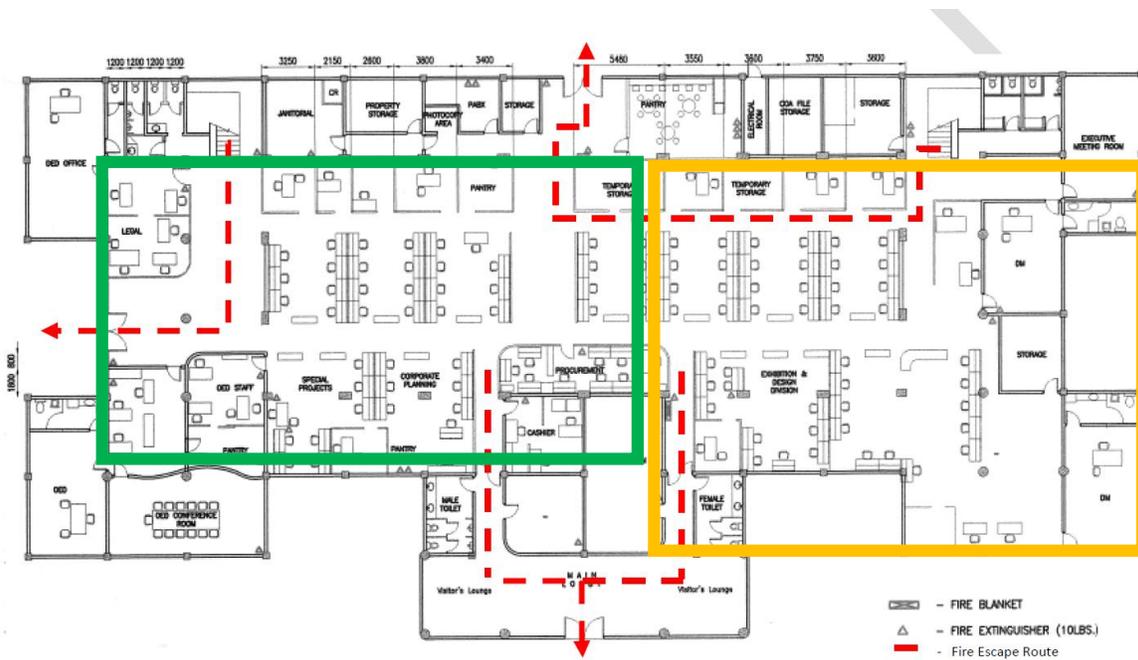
Golden Shell Pavilion 2nd Floor Evacuation Plan
